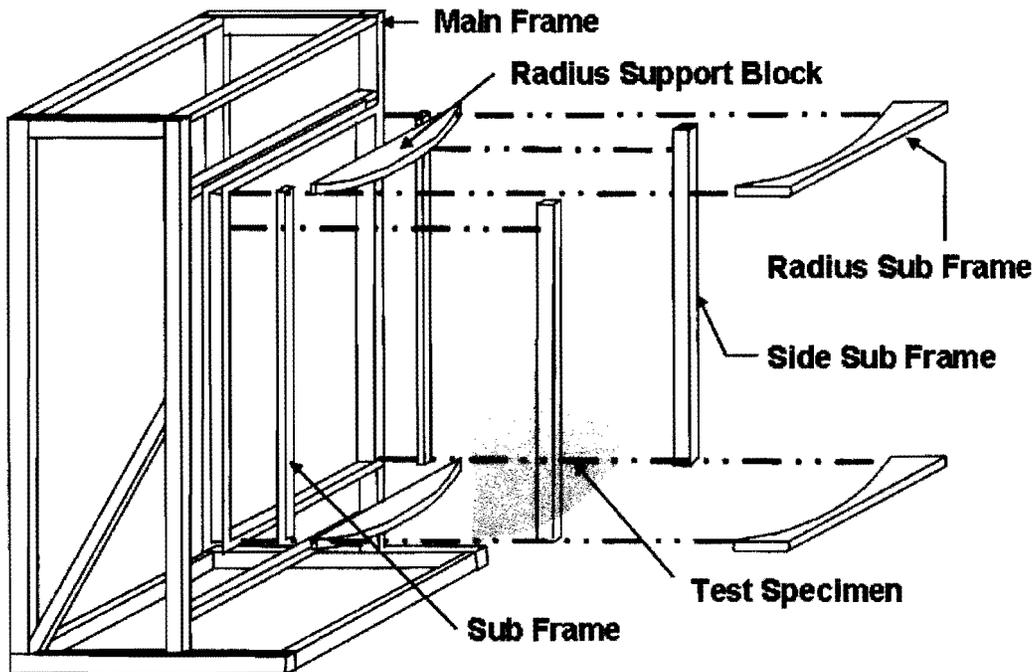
Bent Glass Impact Test Frame (Exploded View)
